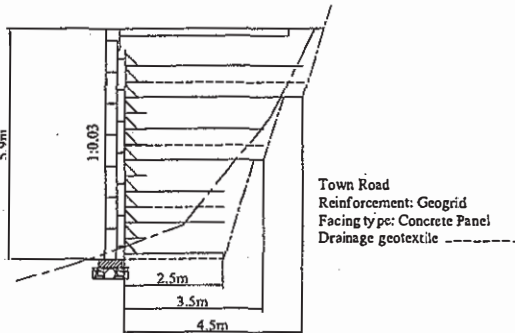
The Geosynthetic reinforced retaining wall used for town road
